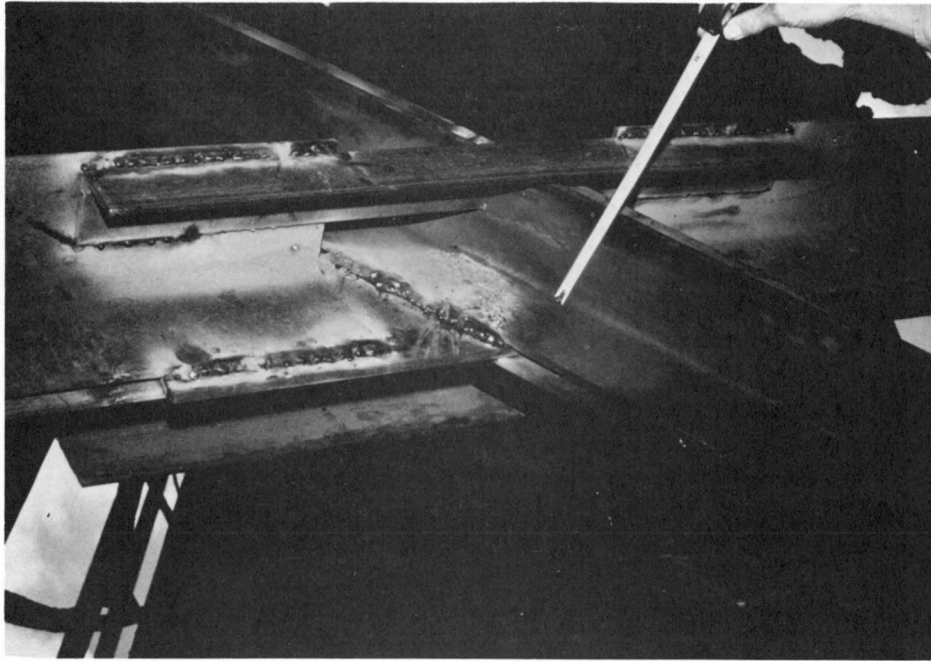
VIEWS OF INTERSECTION DETAILS
